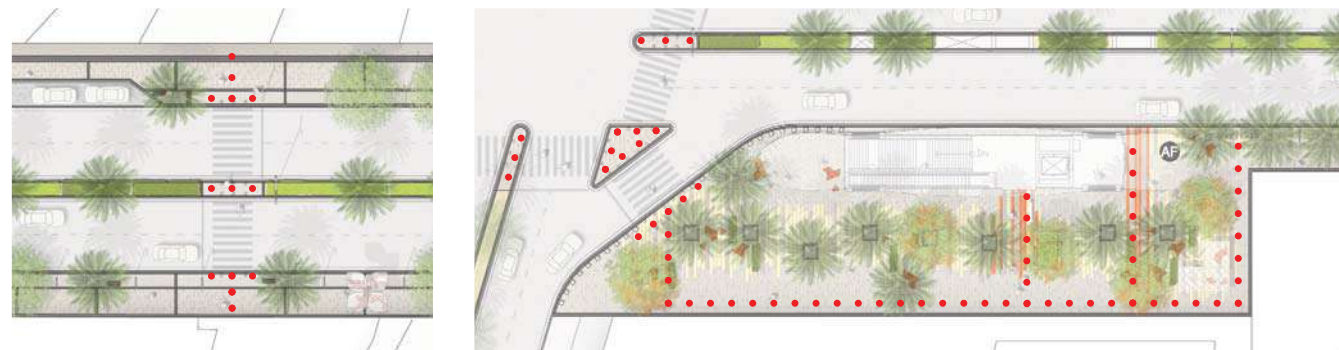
Tactile paving layout at pedestrian crossings and stations
